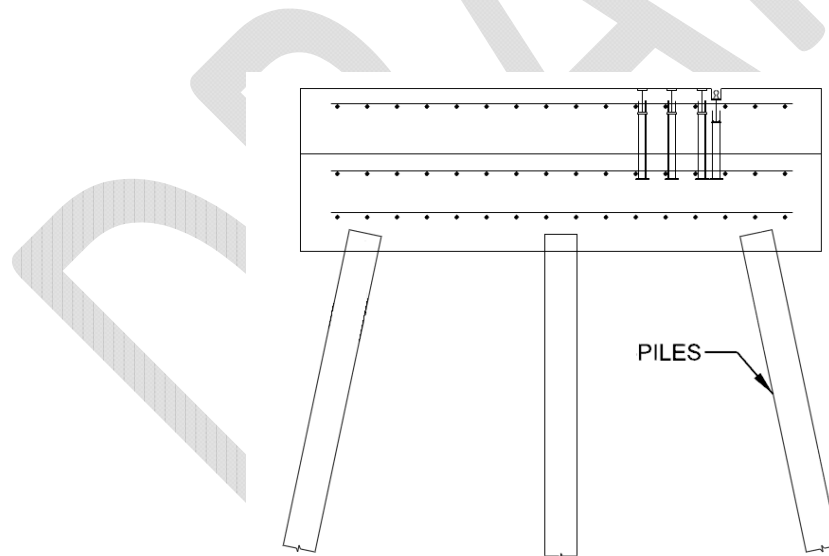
Typical Elevation of a Foundation for a Closure Gate
